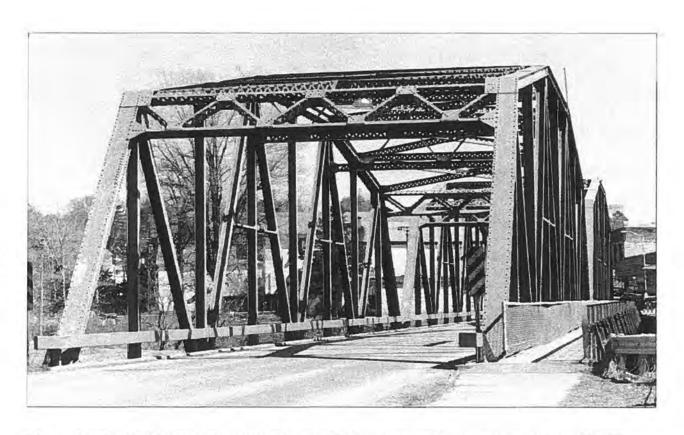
The STH 78/81 (Argyle) Bridge (P-33-088) displays the clean look of the SHC's Warren overhead standard plan. (Source: WisDOT).
